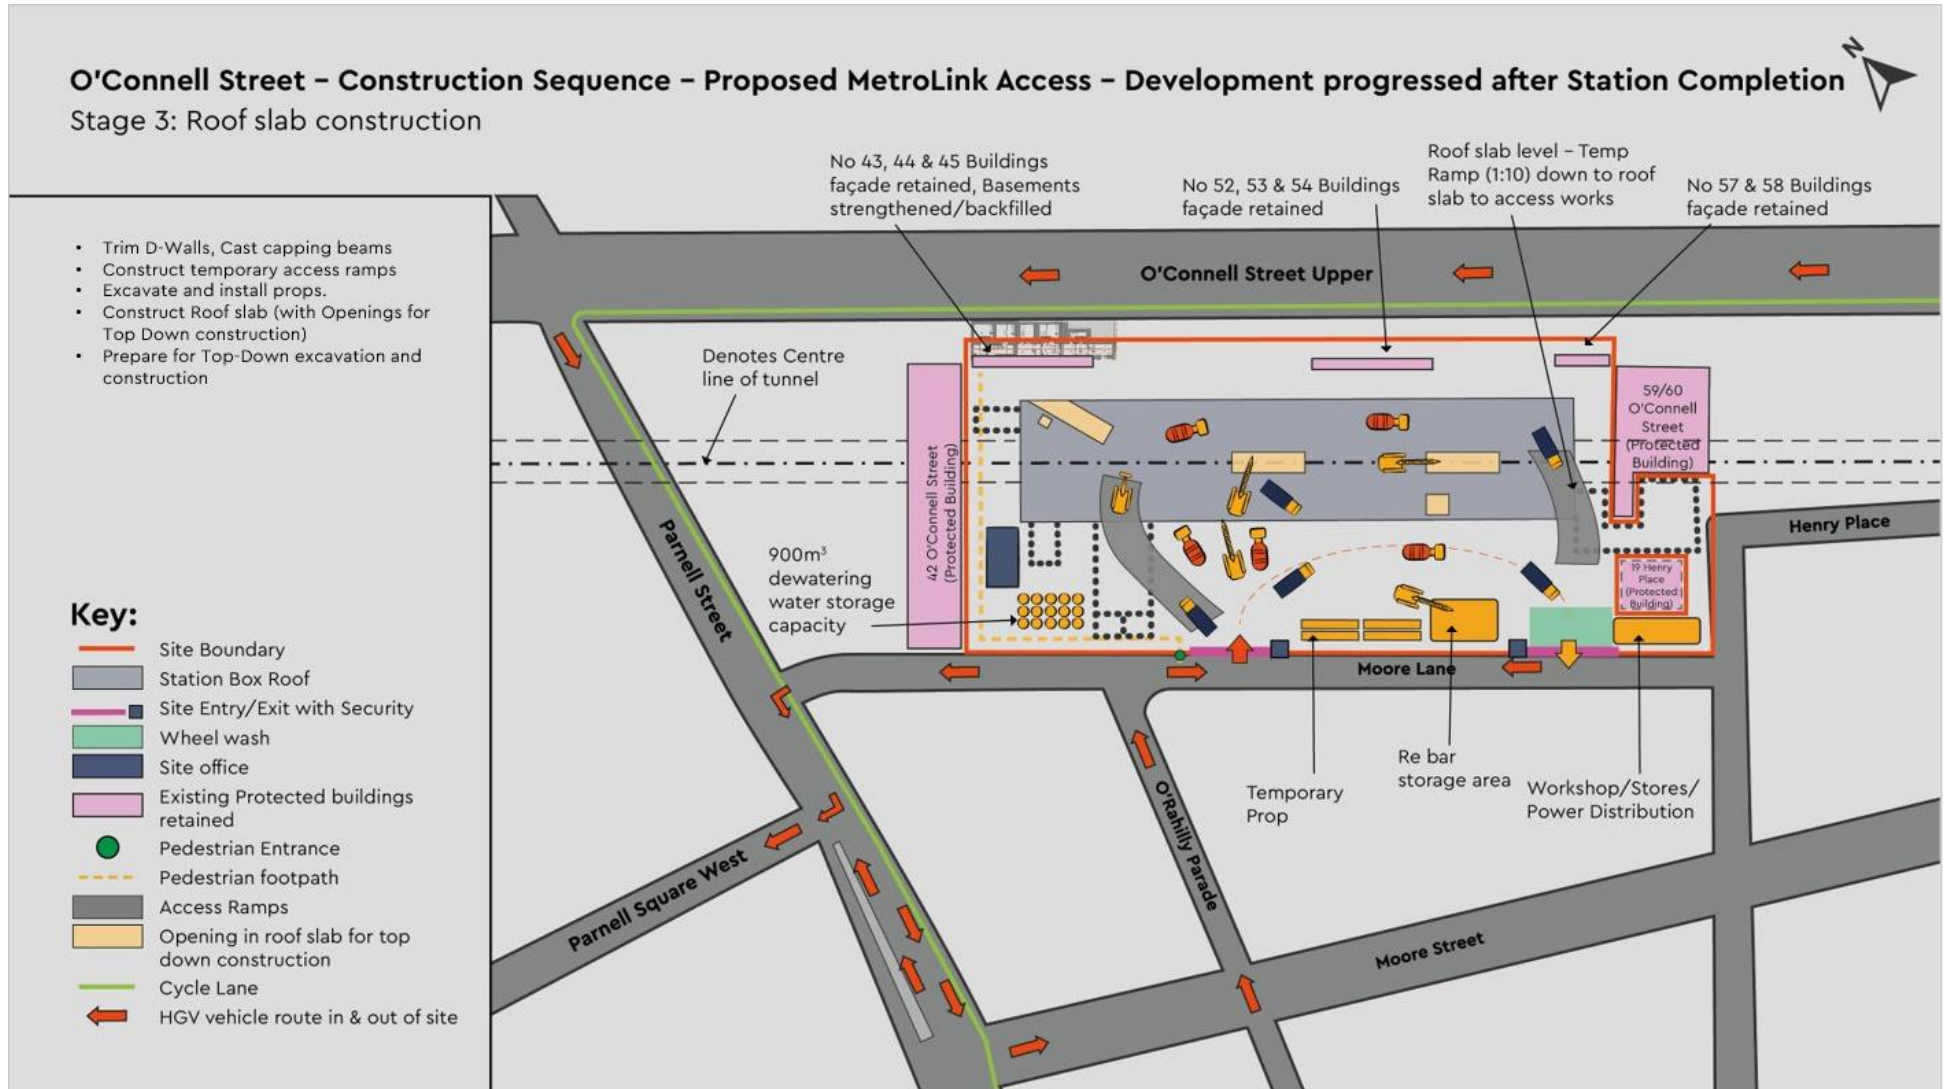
O'Connell Street Stage 3 – Roof slab construction
